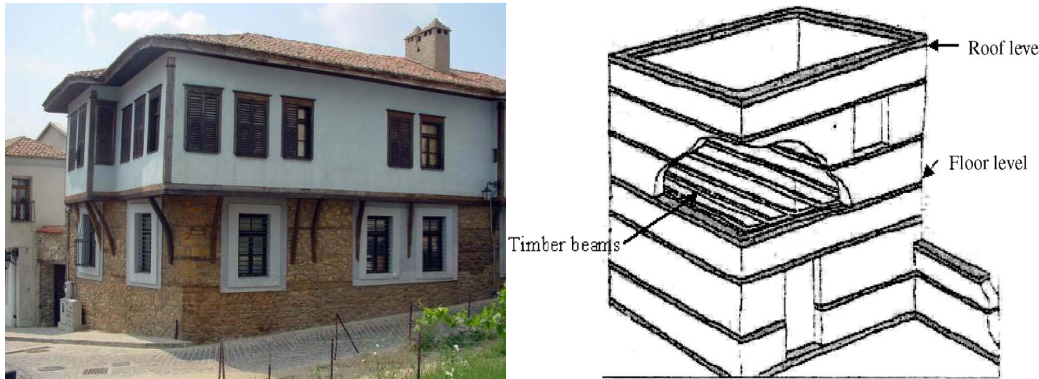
(a) Typical example of timber laced stone-masonry dwelling in Xanthi. (b) Layout of TLM (from Vintzileou 2008).
